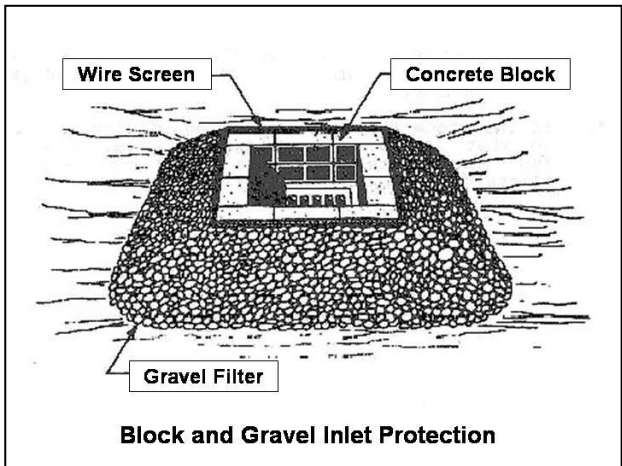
Typical Details of Block and Gravel Inlet Protection
